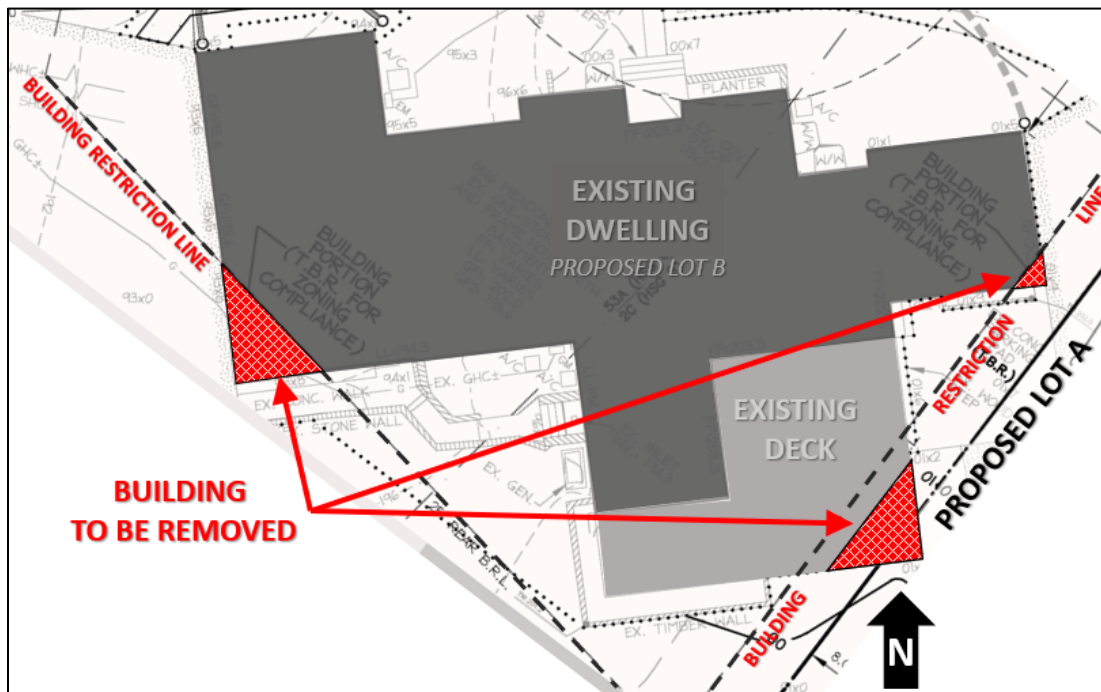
Partial Demolition of Existing Dwelling on proposed Lot B
